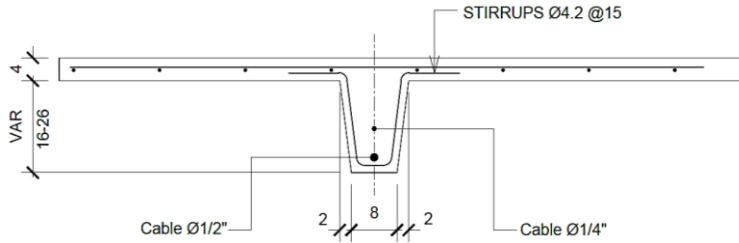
Joist cross-section description and reinforcement detail (units in cm).
